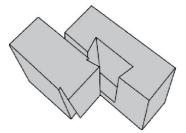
The rounded dovetail joist for the test specimen (drawn by Emre ILGIN).
